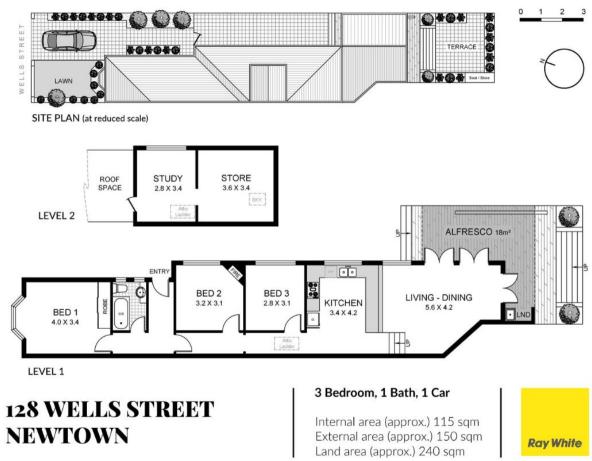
Site and floor plan of No. 128 Wells Street. Source: realestate.com
